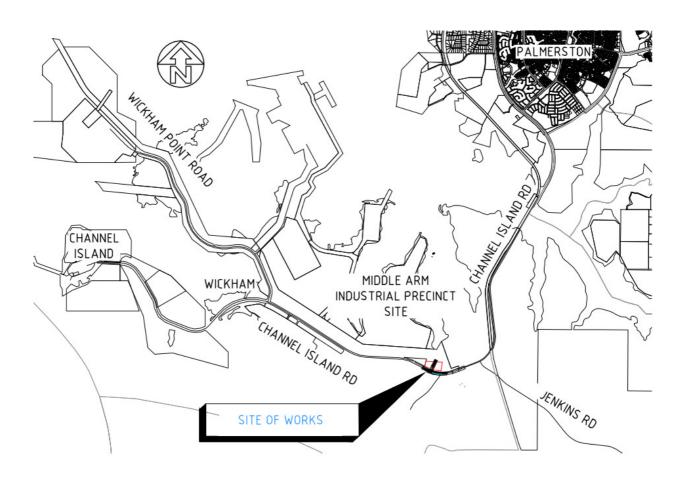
Locality Plan (Works Proposed Within Road Reserve)
